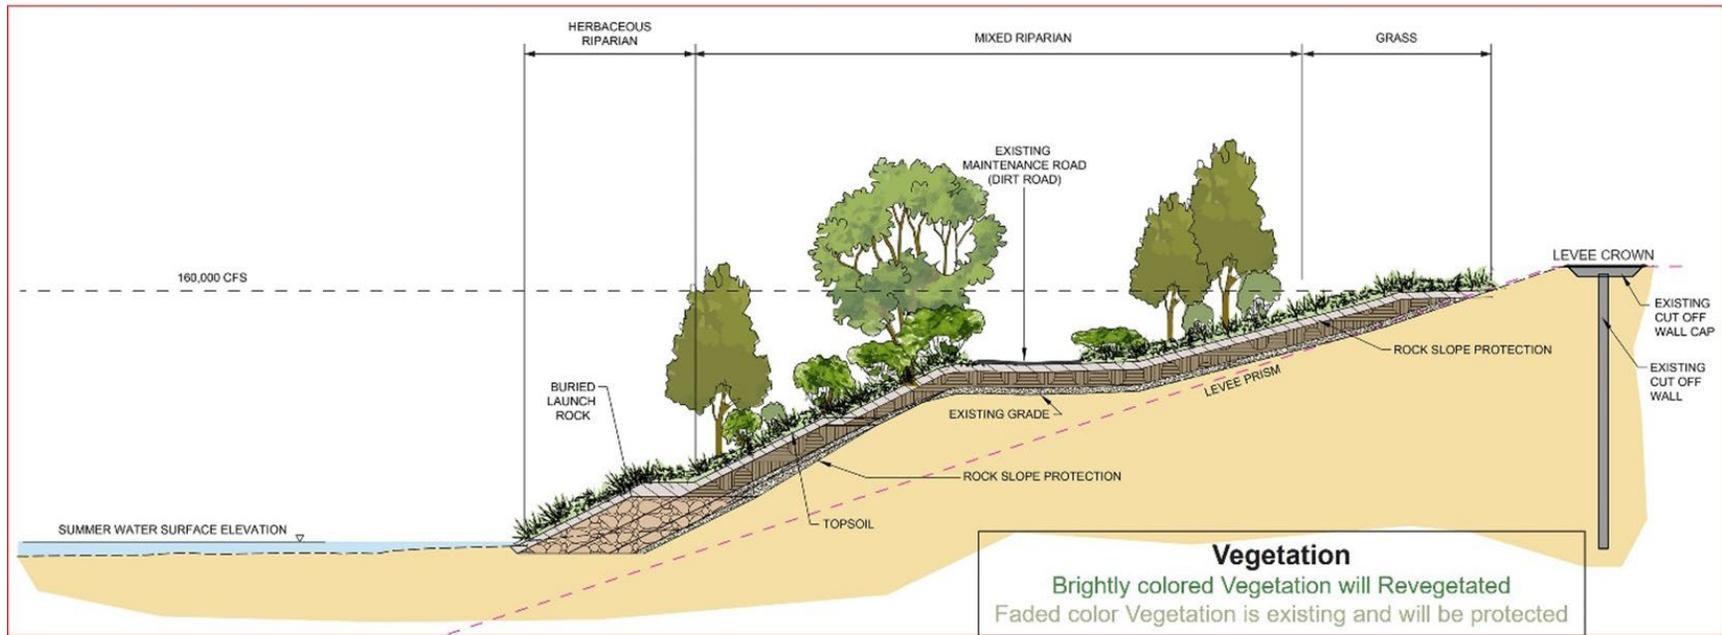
Example cross section of launchable trench and bank protection found at American River Erosion Contract 3B South Site 4-1, just upstream of Watt Avenue Bridge
